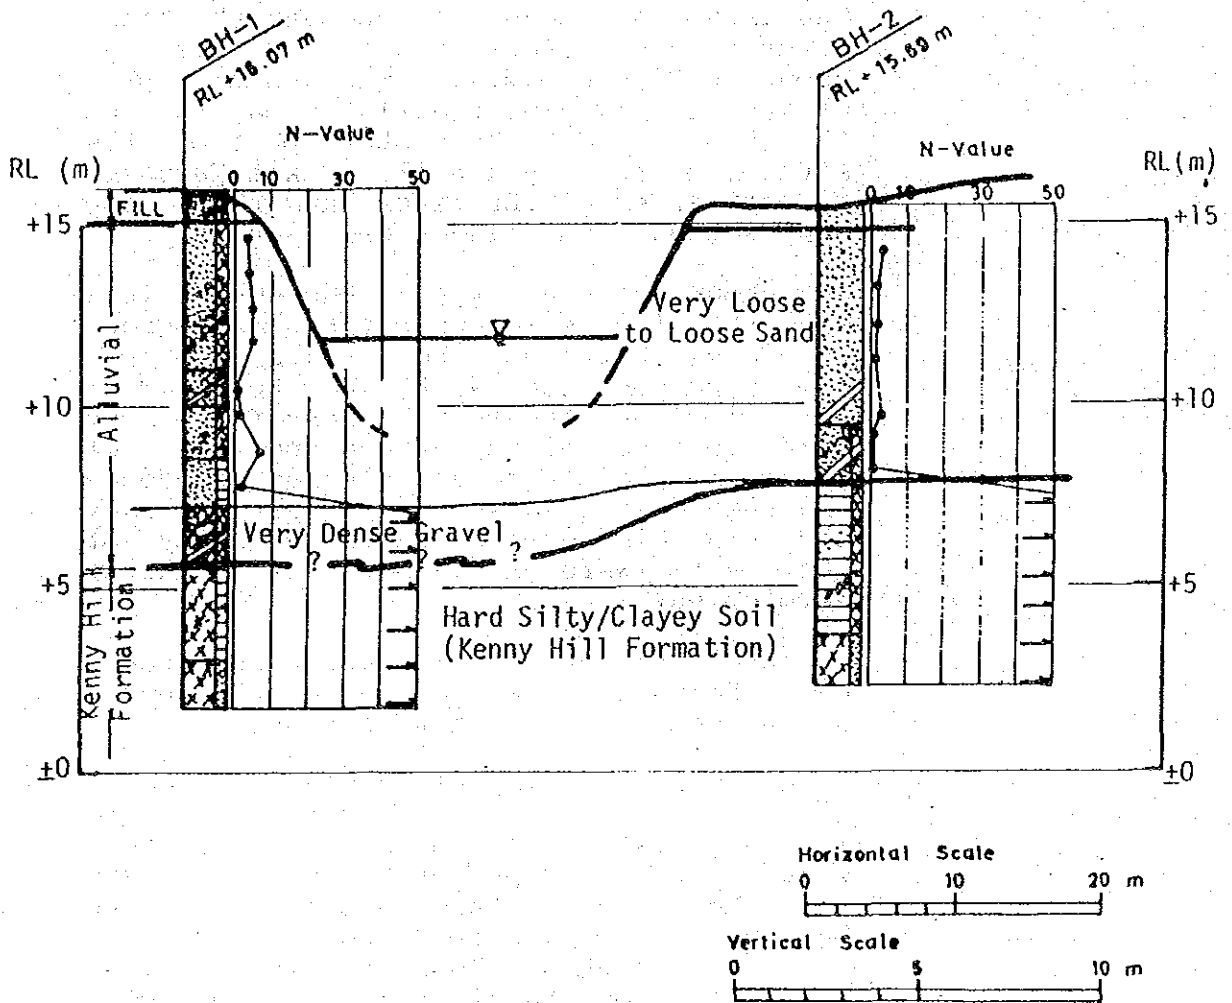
Soil Profile at Klang River Bridge Site
